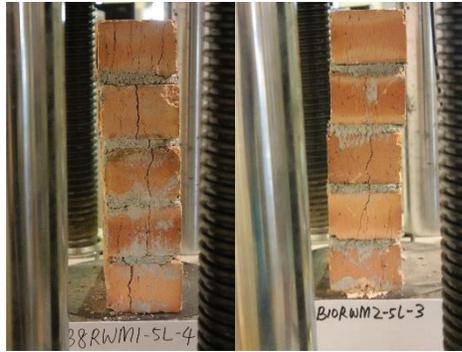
Failure mode of pre-wetted clay masonry prisms
